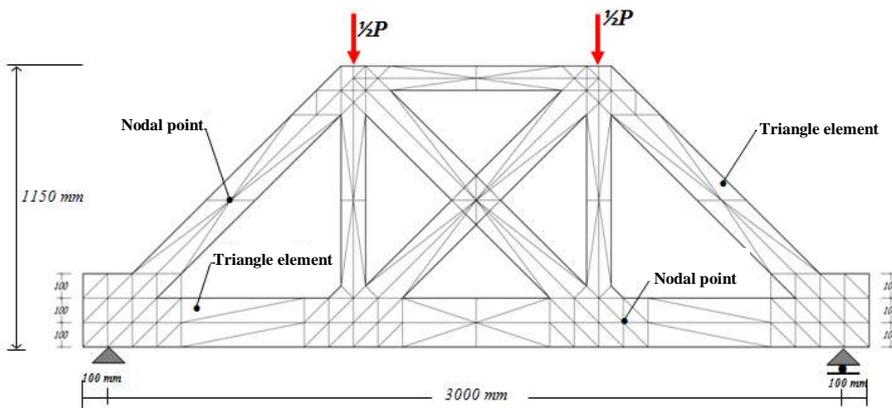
Discretization of the bamboo reinforced concrete bridge frames.
